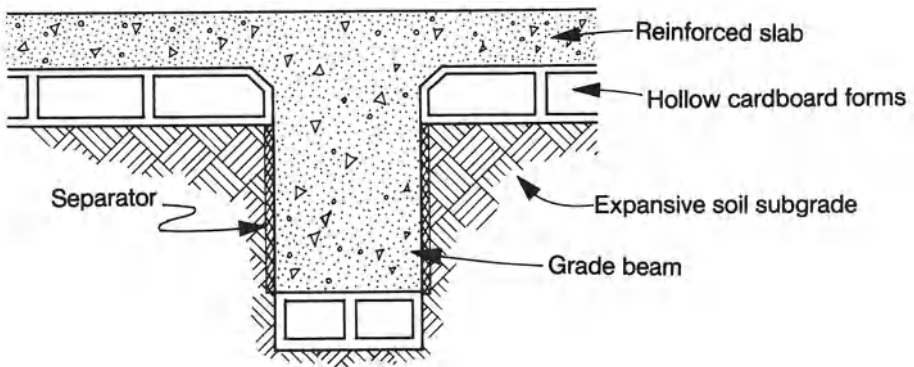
Construction of slab on ground with hollow cardboard forms.
